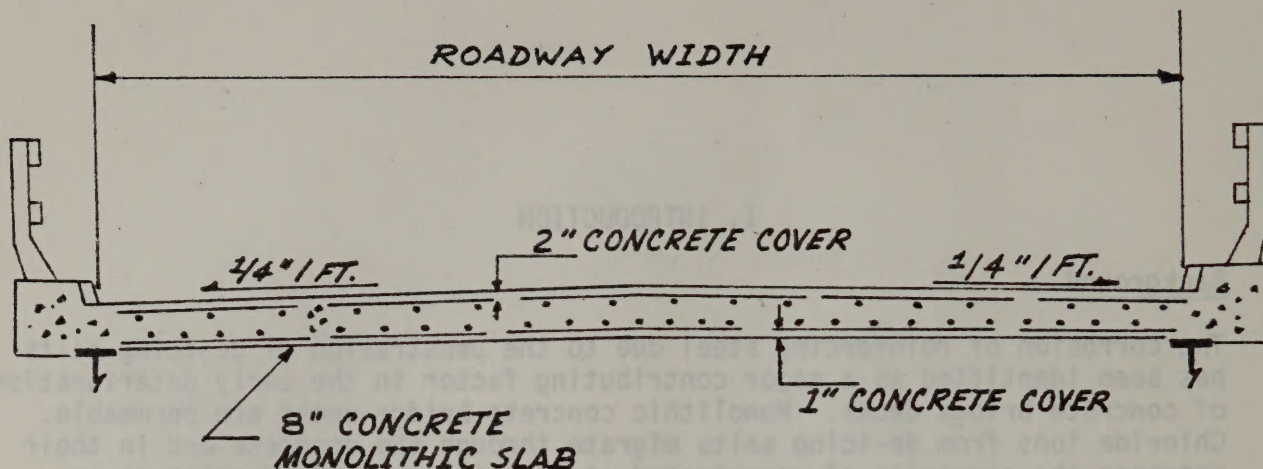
Typical Transverse Section: 8" - Monolithic Concrete Bridge Deck
